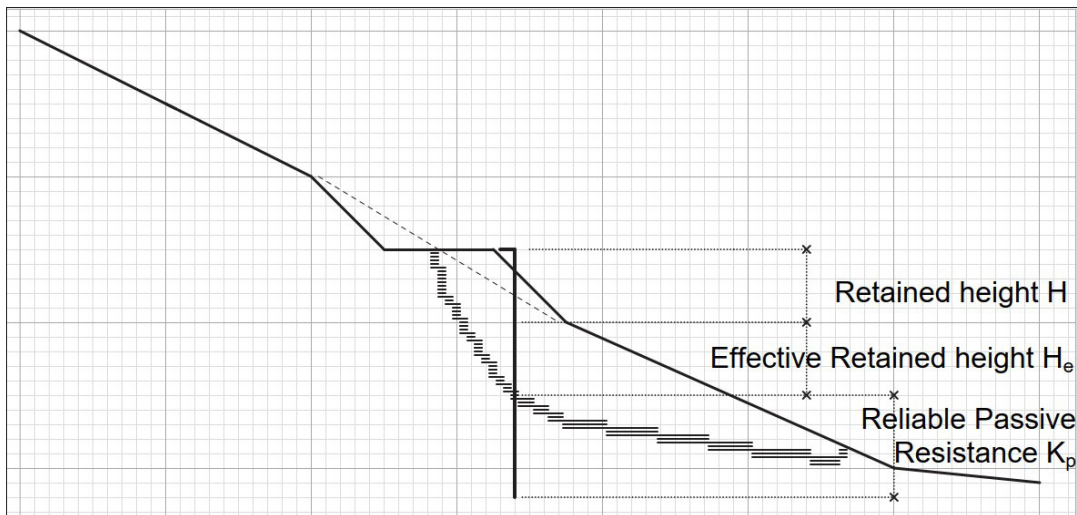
Schematic retaining wall solution to stabilise an active underslip showing design criteria
